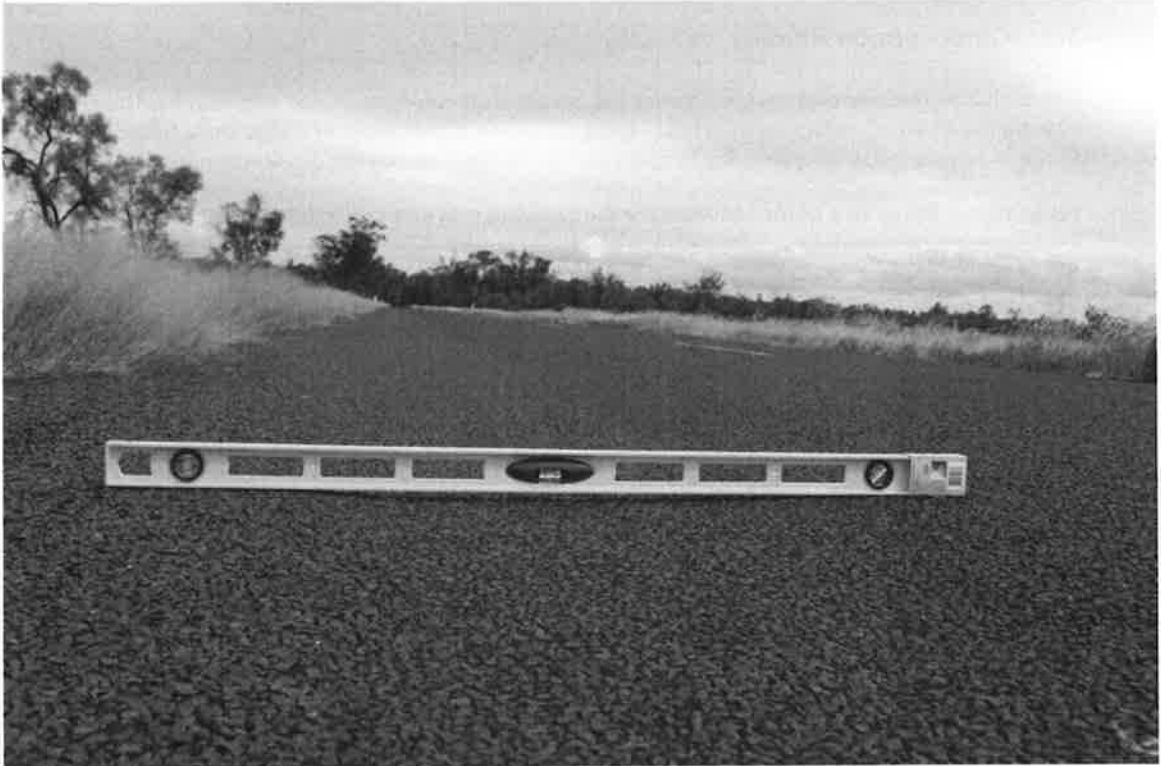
Sunnygirl Access – Yelarbon-Texas Road; road profile deflection due to traffic loads
